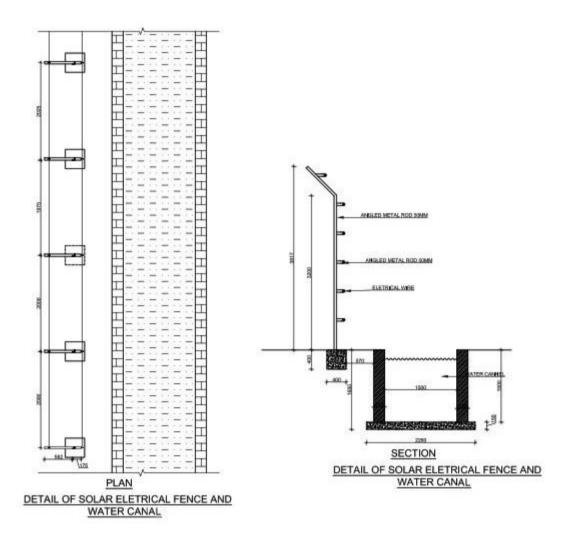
Plan of Solar Powered Fence & Drainage Canal
